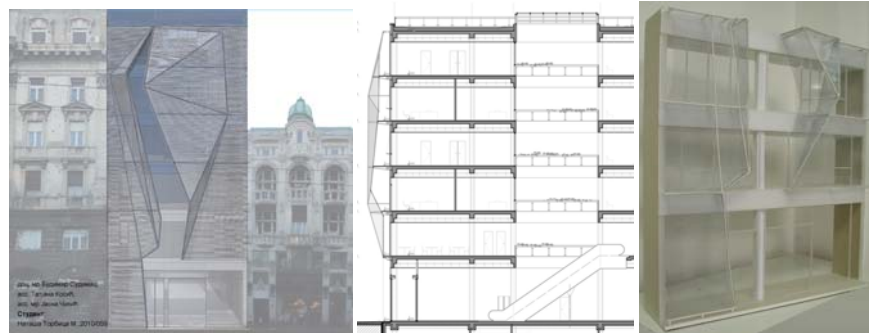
Elevation, cross-section and model of the street facade of Model 1
